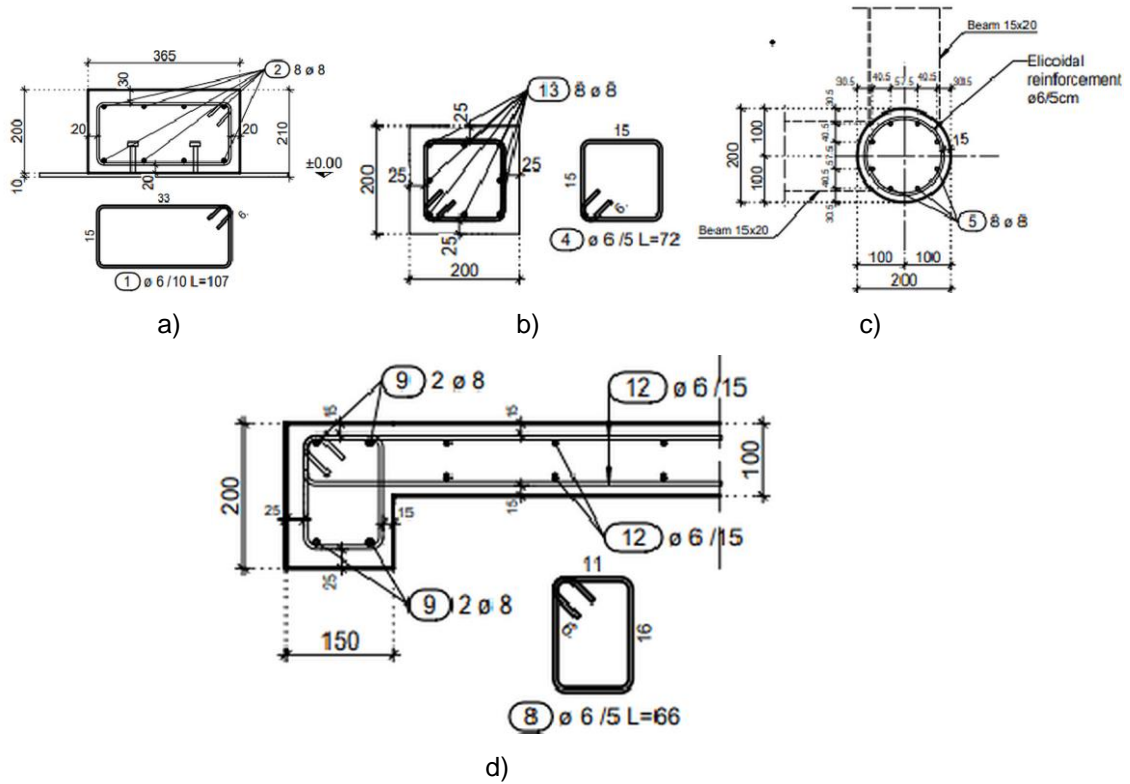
Reinforcement detailing: a) Foundation beam; b) Square column; c) Circular column; d) beam and slab
